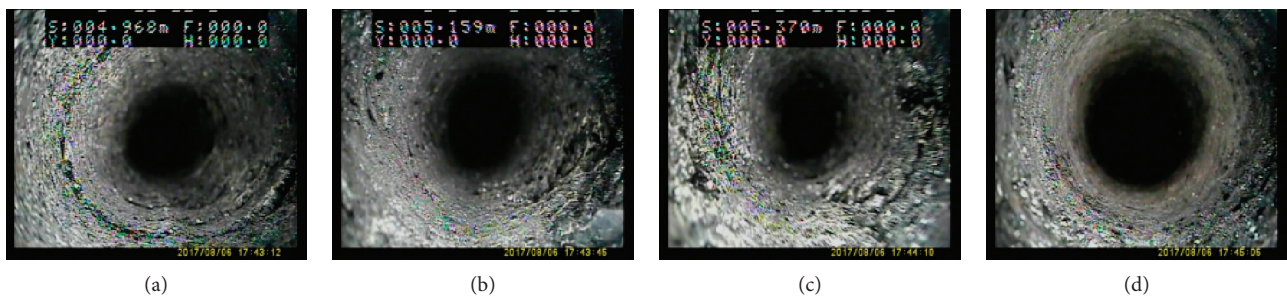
The distribution of the surrounding rock (2.5–3.8 m) outside the anchor zone. (a) 2.5 m. (b) 2.9 m. (c) 3.4 m. (d) 3.8 m.
